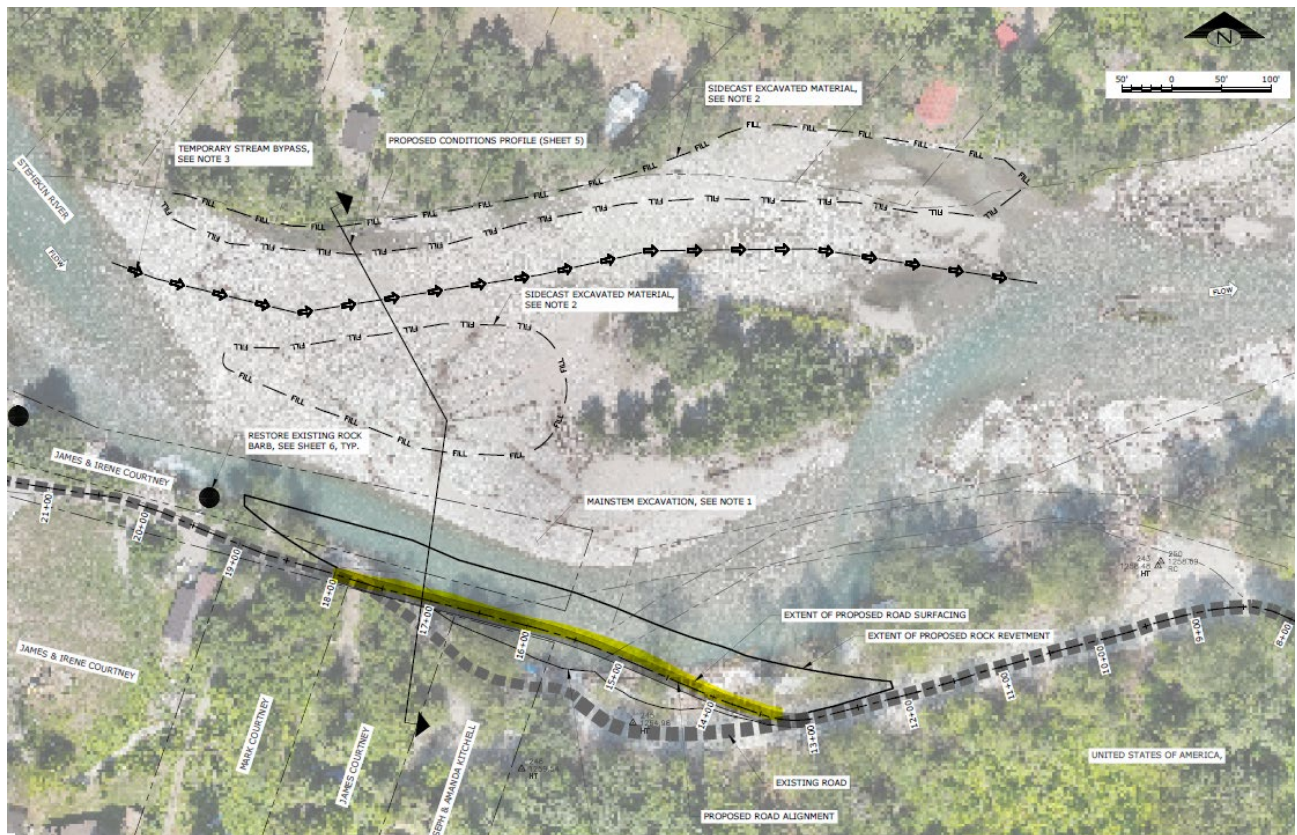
Chelan County's plan to reconstruct the second portion of the Company Creek Road. Proposed new road highlighted in yellow.
